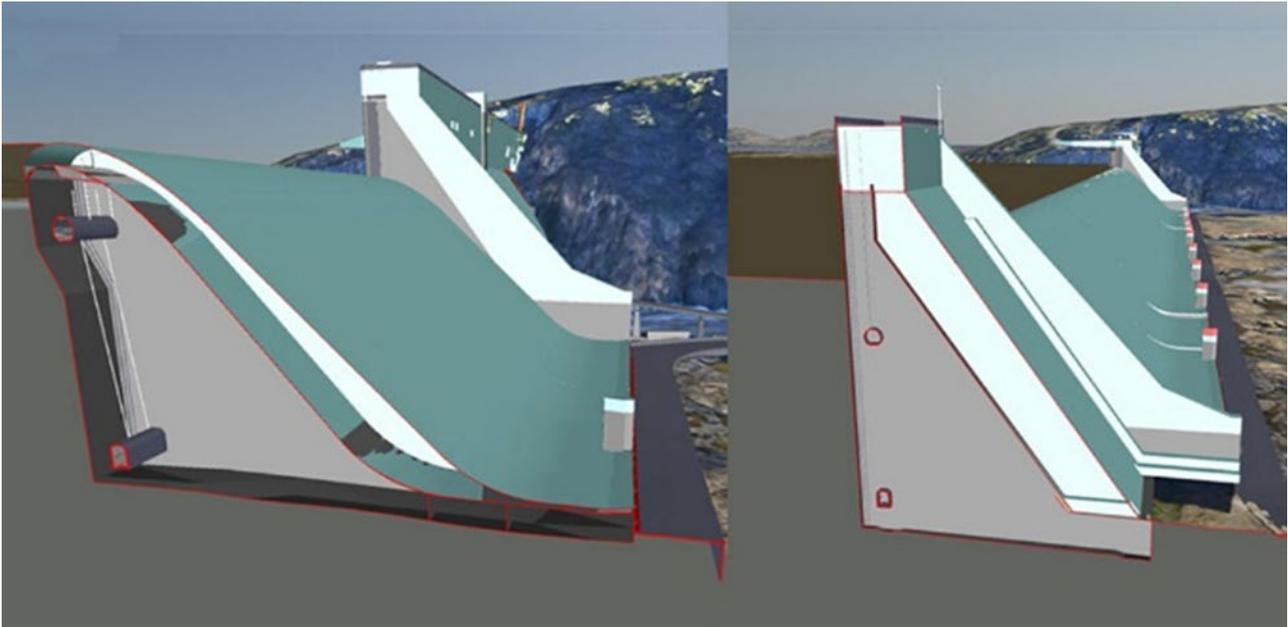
Preliminary design for dam raising and improvement works – cross section of spillway and abutment raising for illustrative purposes only.
